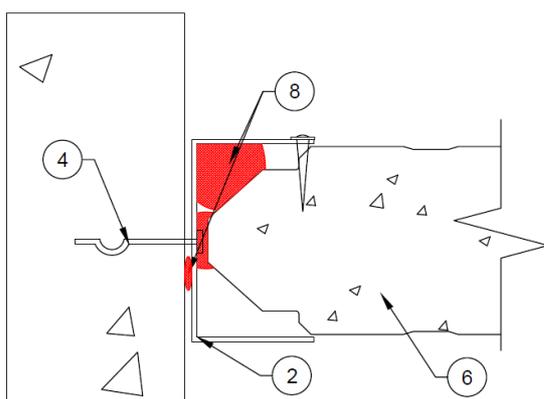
Male Panel End Detail for Vertical Speedpanel Wall
